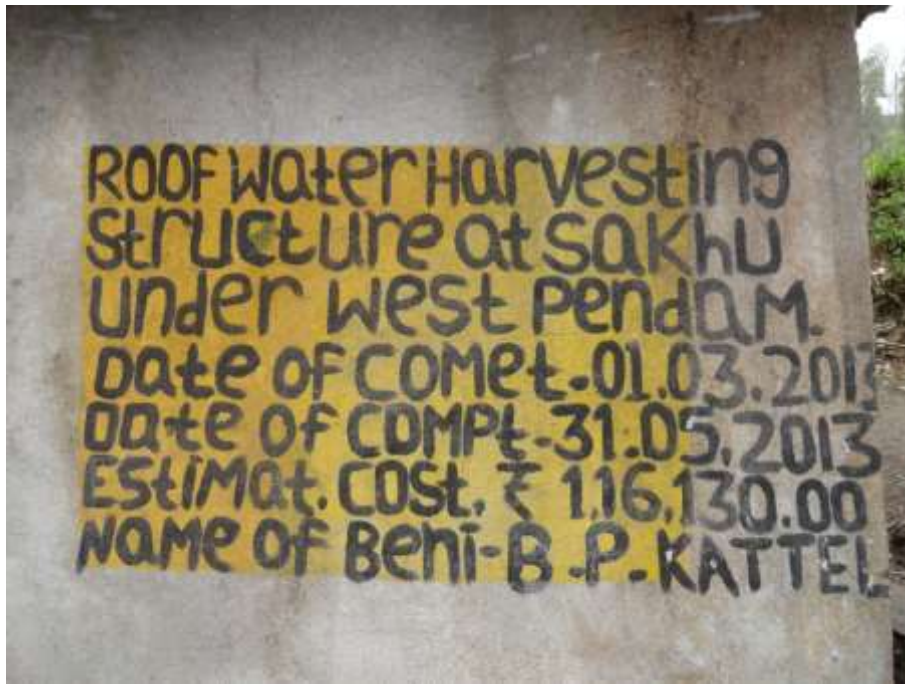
Roof Top Rain Harvesting Structure Provided by the Government
